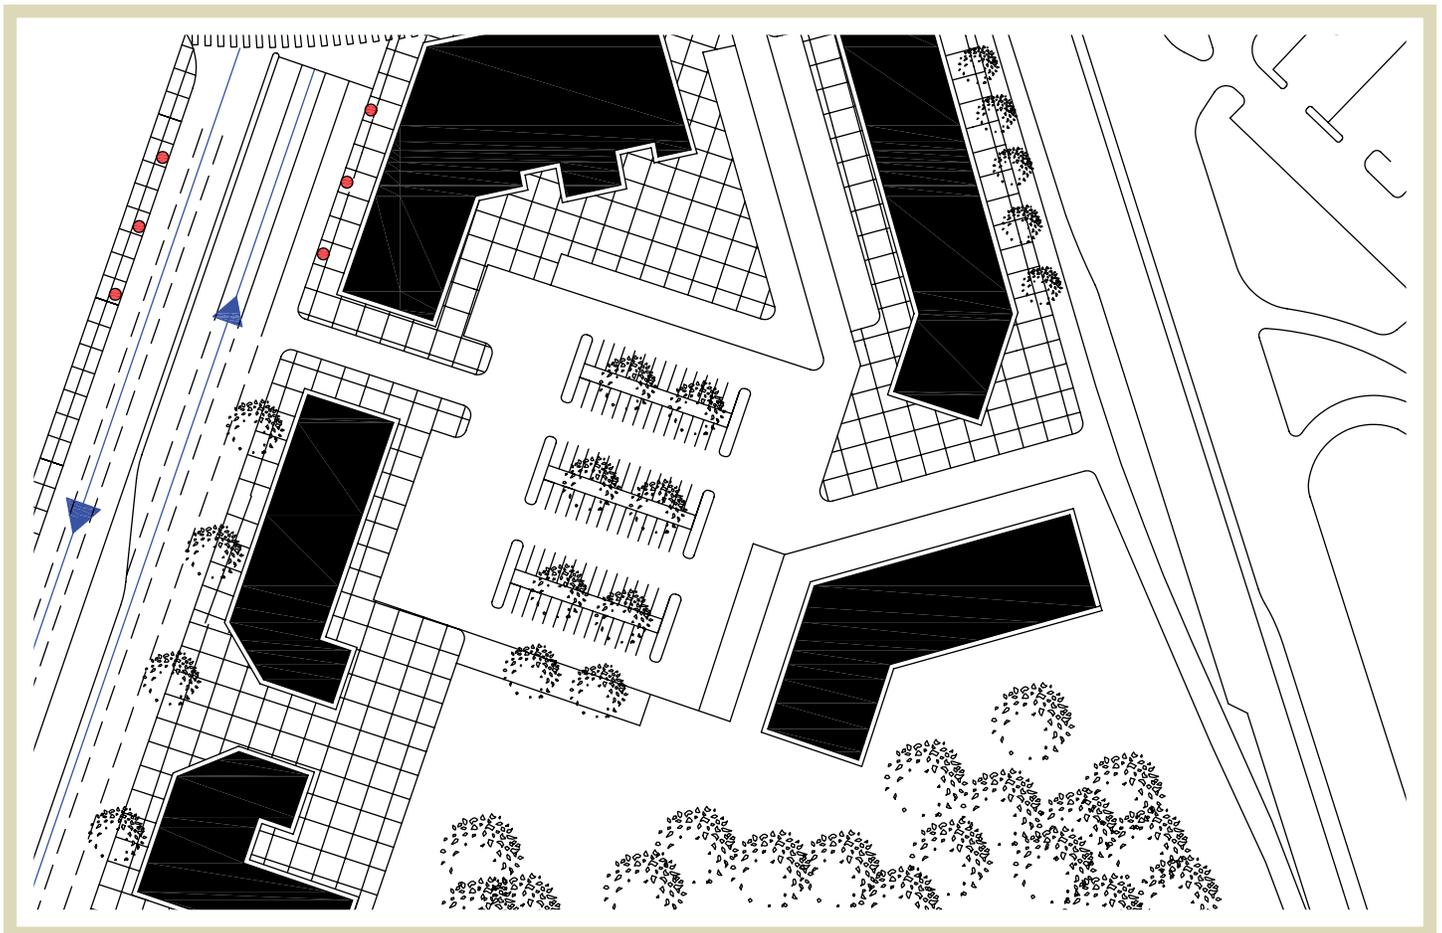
| Shopping centers can be made more accessible to transit riders and pedestrians by locating parking at the center and providing primary transit stops along high-traffic corridors.
